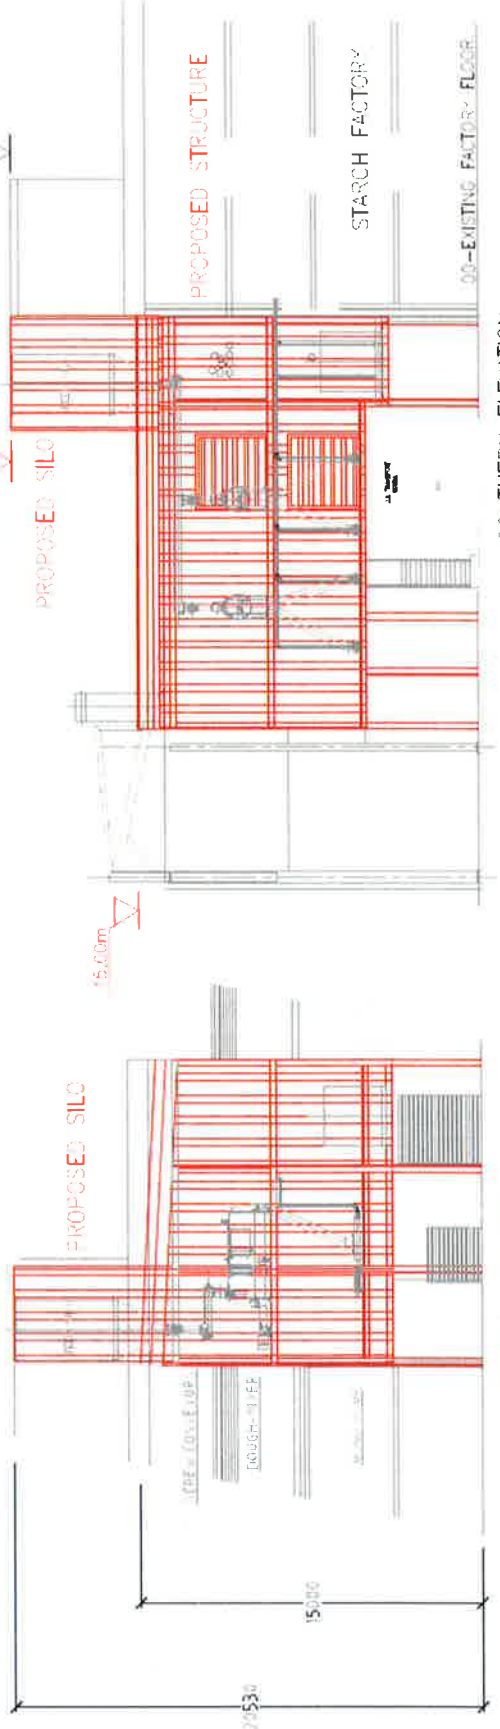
Location of Proposed Dough Mixer Building at the Factory
